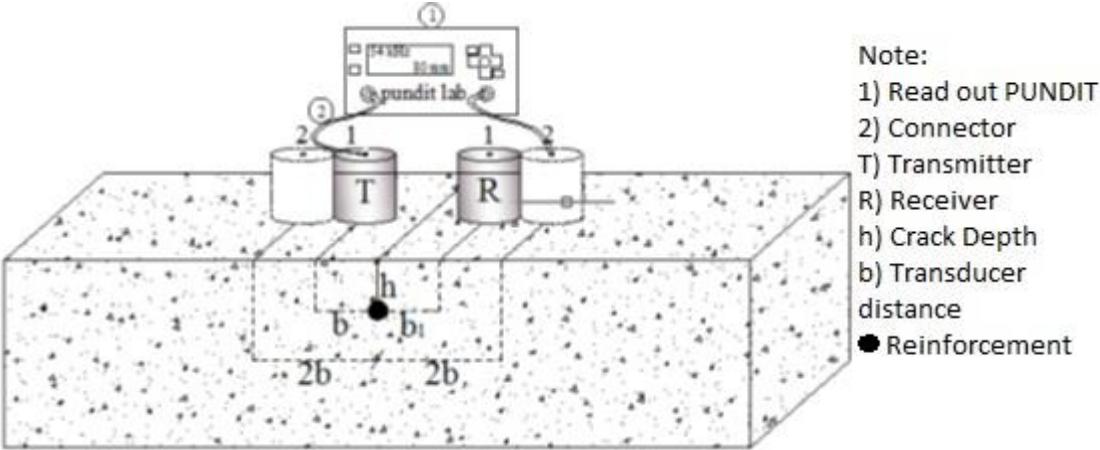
Concrete Crack Depth Testing scheme (Baehaki et al., 2019)
